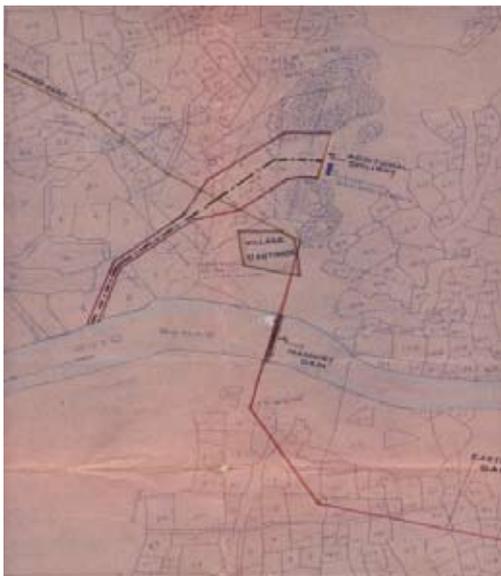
Alignment of Dantiwada Dam and Additional Spillway
